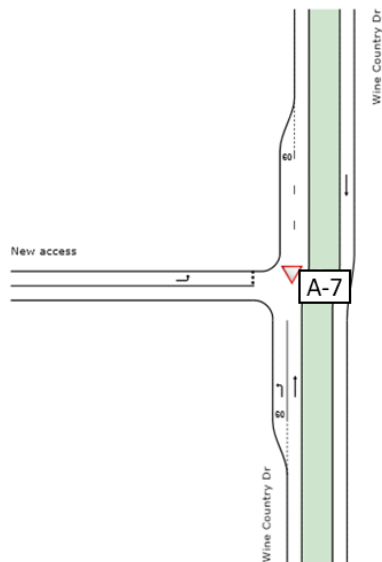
Proposed new left in / left out access on Wine Country Drive south of Bakehouse Road
